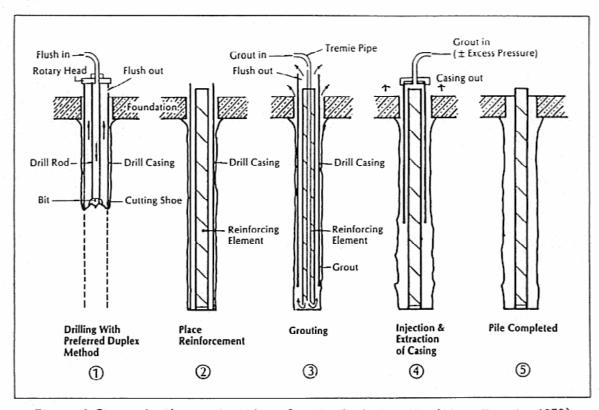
Stages in the construction of a standard pin pile (After Koreck, 1978)
